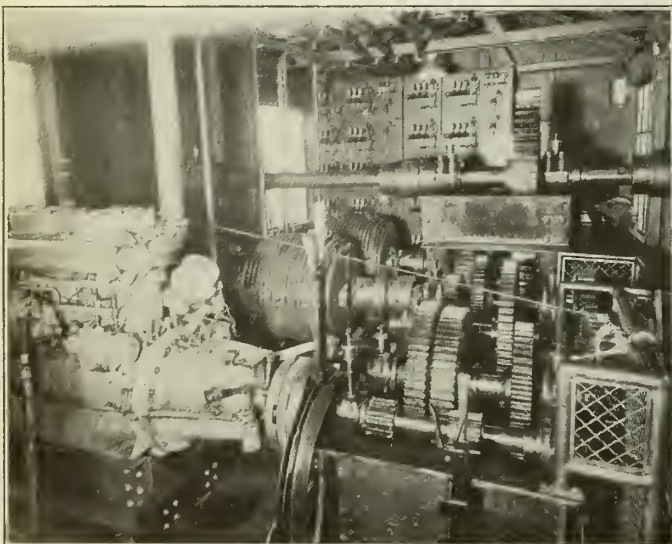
Bridge No. 17—View Inside of Machinery House.
